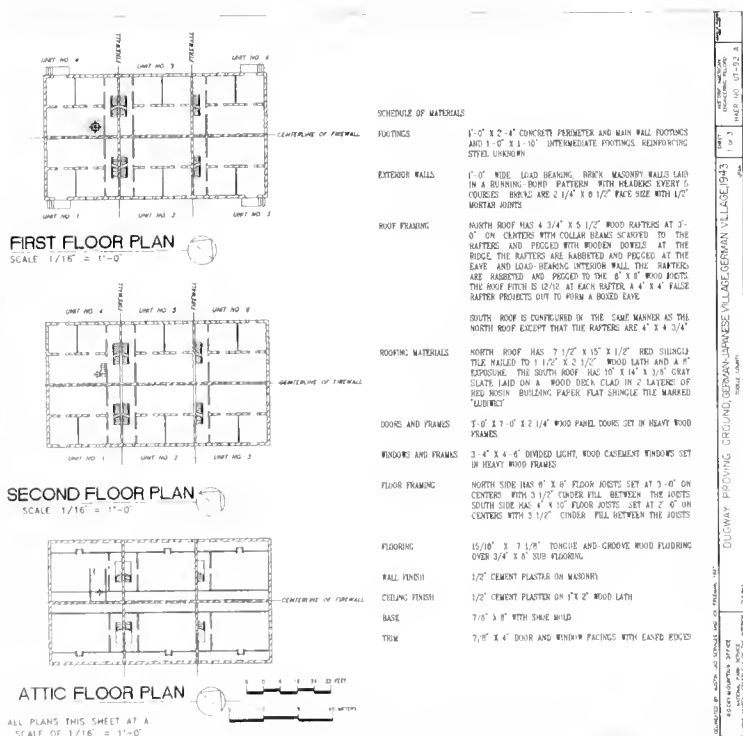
Floor Plans, German Village, Dugway Proving Ground
